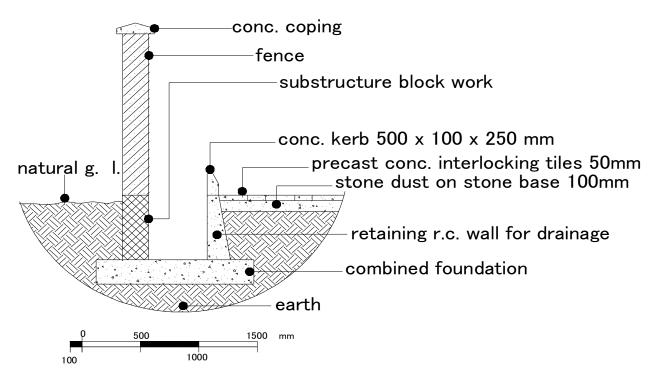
Figure II: Section through the Combined Foundation base, Fence, Drainage Channel and retaining wall Source: author's design.
